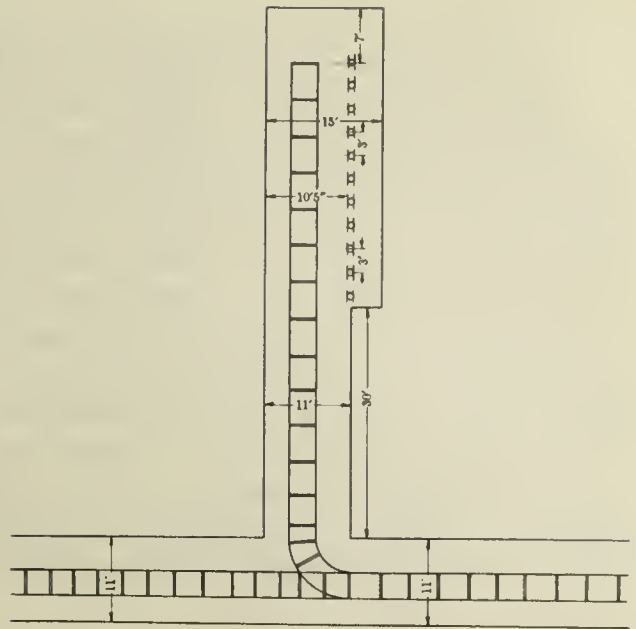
POSITION OF POSTS IN ROOM 15 FEET WIDE BEFORE THE COAL IS UNDERCUT
